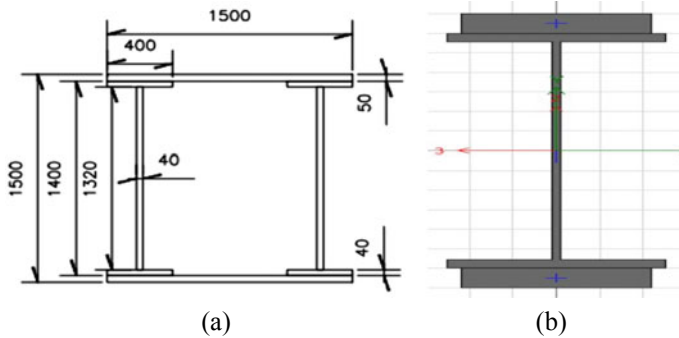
a Interior column [1], b ISWB600 with top and bottom plate of 220 mm × 50 mm
